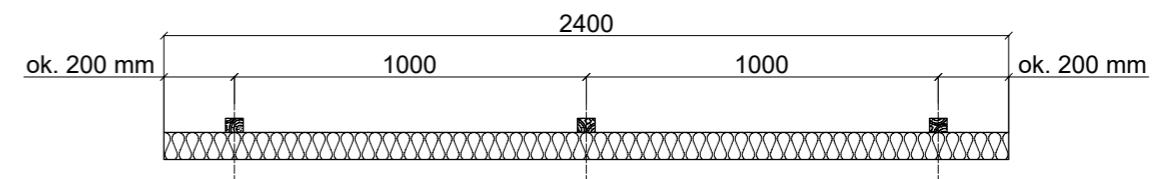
Spacing of construction elements for fixing 1200 x 2400 mm boards
